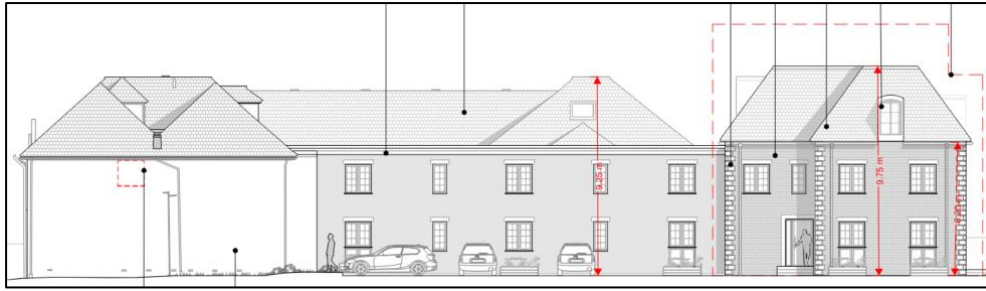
Proposed side elevation showing flat-roofed linking/hallway extension
